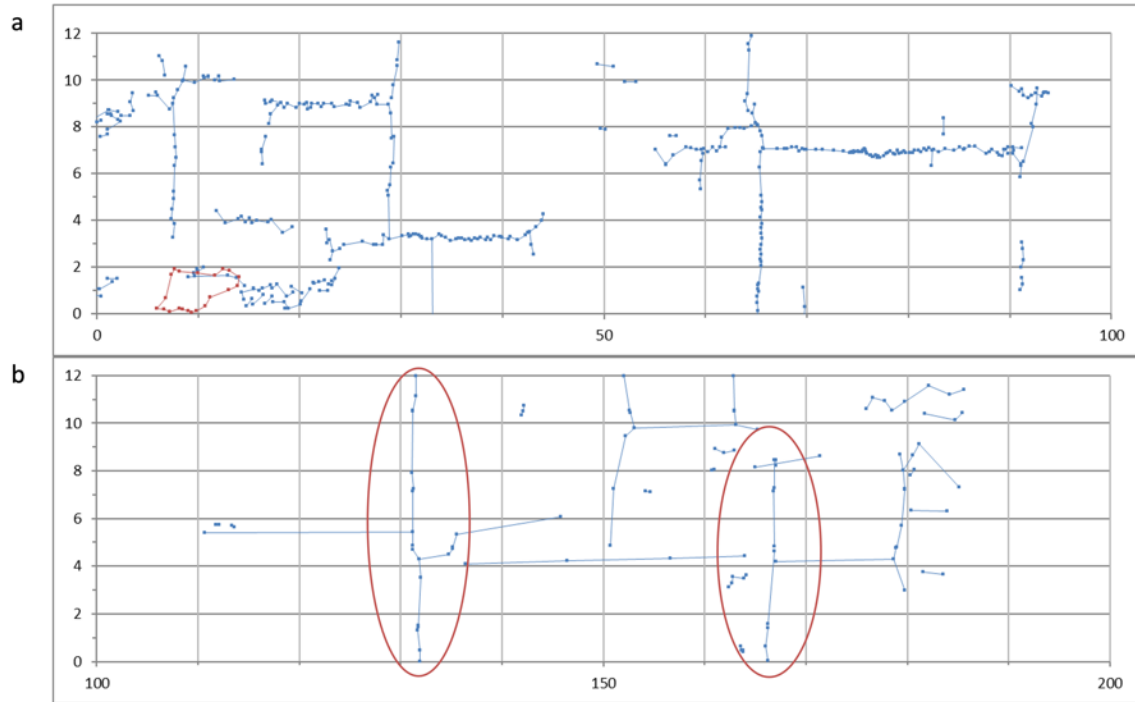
Section E7B Cracking Results (a) Prior to Construction (b) After Loading
